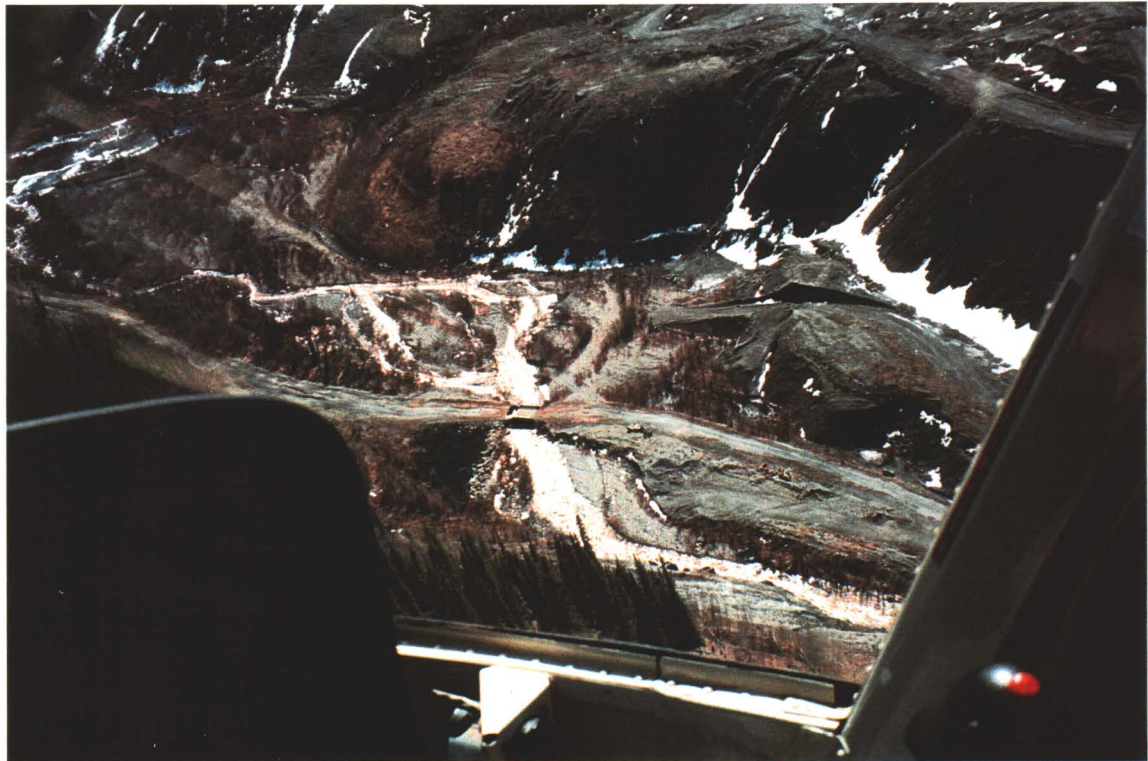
Photo G: Mine road and Clinton Creek (May 1997) - note bridge
